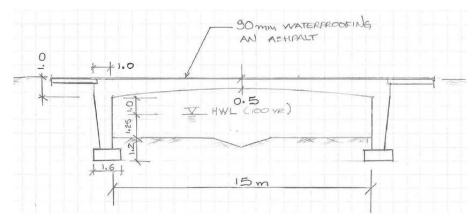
Rigid Frame, Single Span Crossing Arterial A2 Over Rainbow Creek
